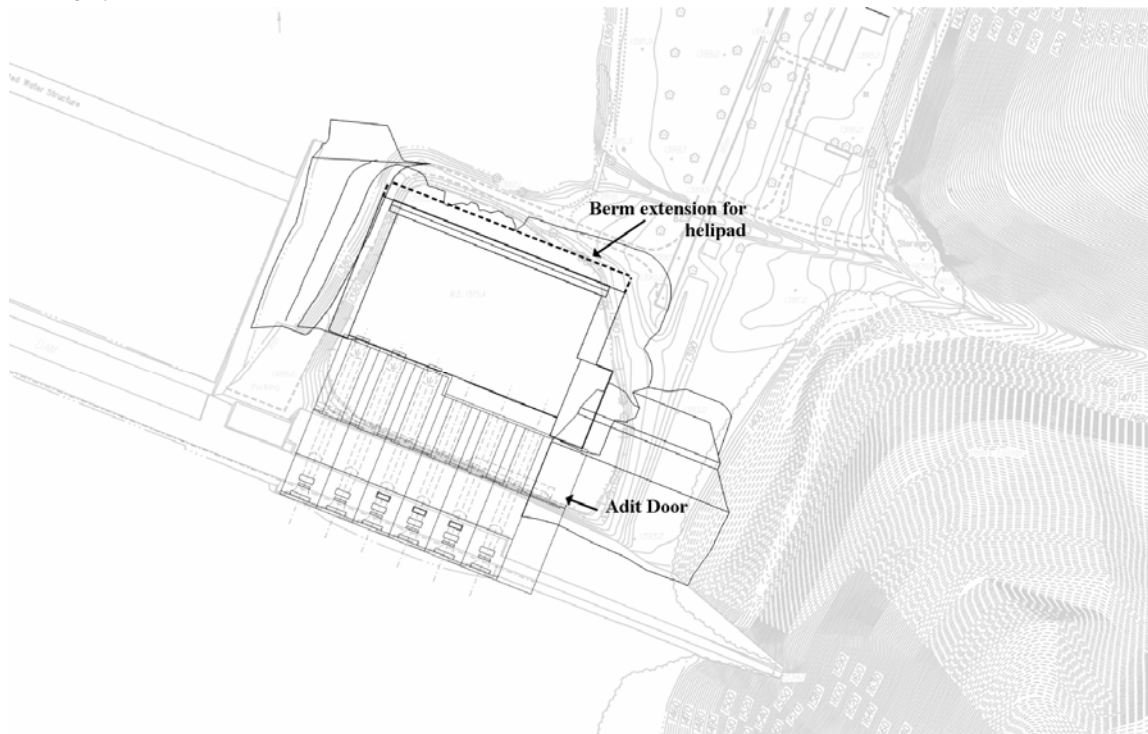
Alternative of extending the length of the planned east abutment berm to accommodate helipad construction.
